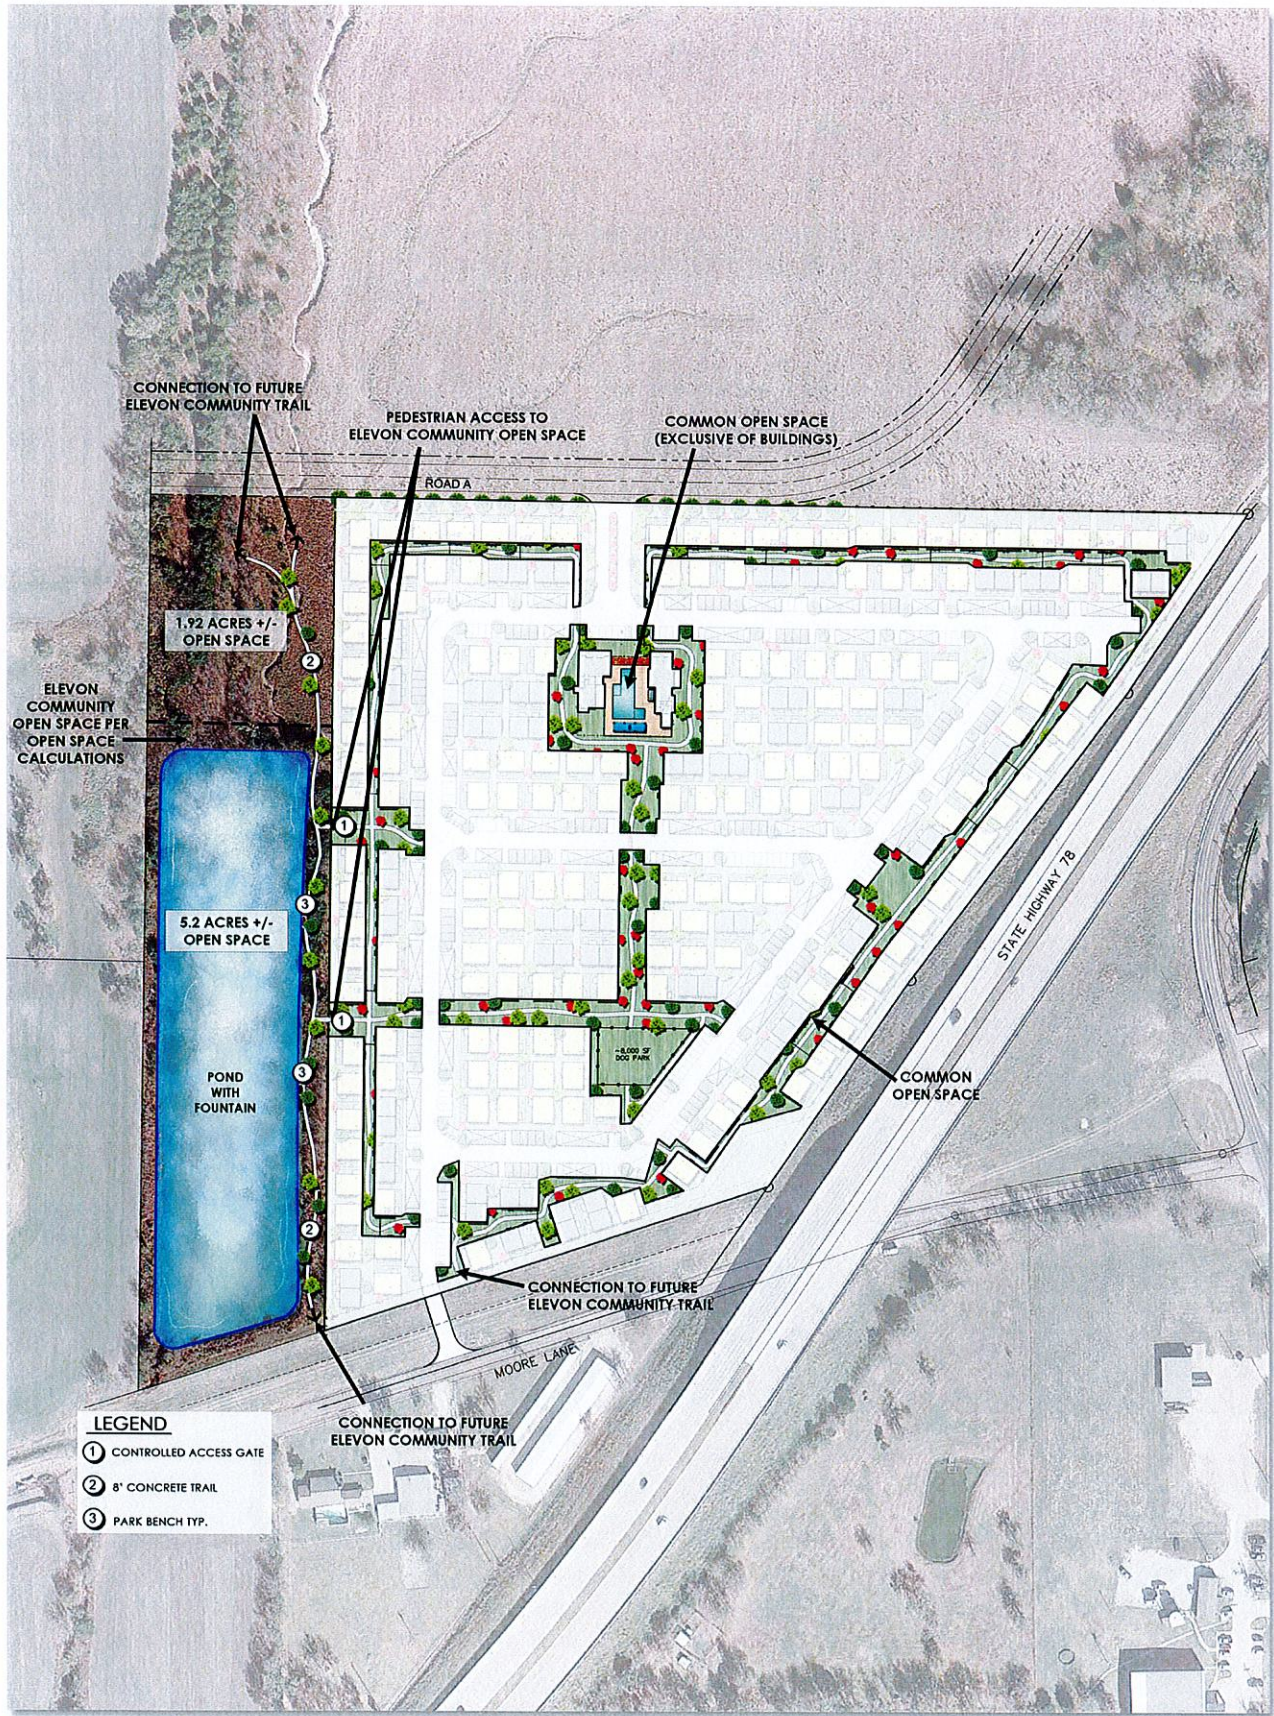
EXHIBIT D - LANDSCAPE AND PLANTING PLAN
